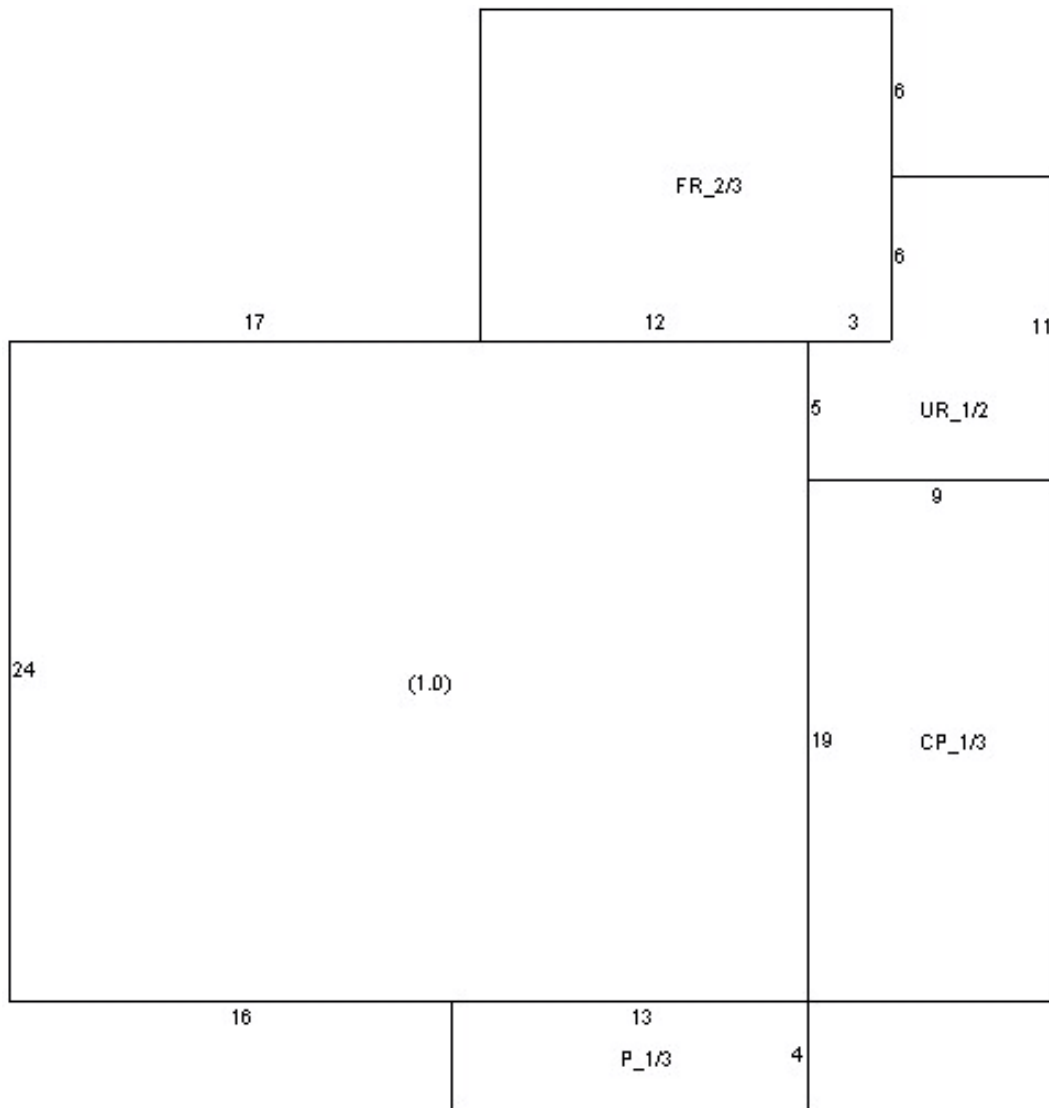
Base area plan of 8BD11302 (Broward County Property Appraiser).
